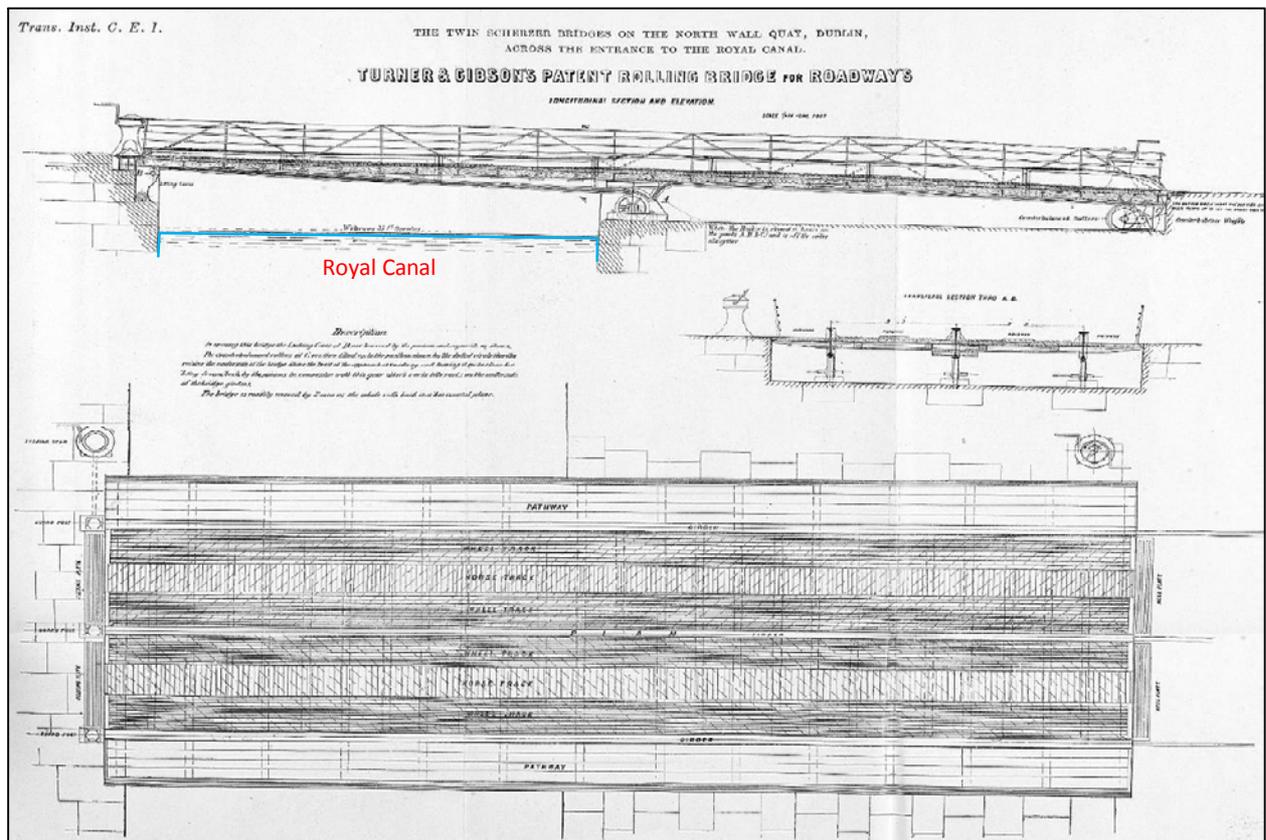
Elevation (looking south) and plan of drawbridge across canal entrance (Griffith 1912, fig.2).
